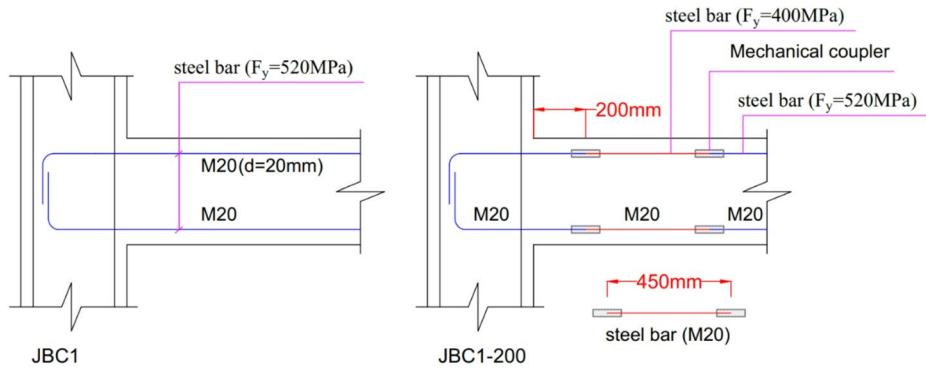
Longitudinal reinforcement details of specimens JBC1 (Youssef et al. 2008) and the proposed DGS system
